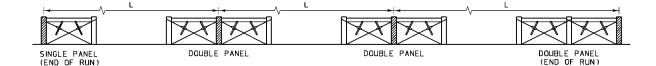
DETAILED DRAWING REFERENCE DWG. NO. 607-05 SECTION 607
